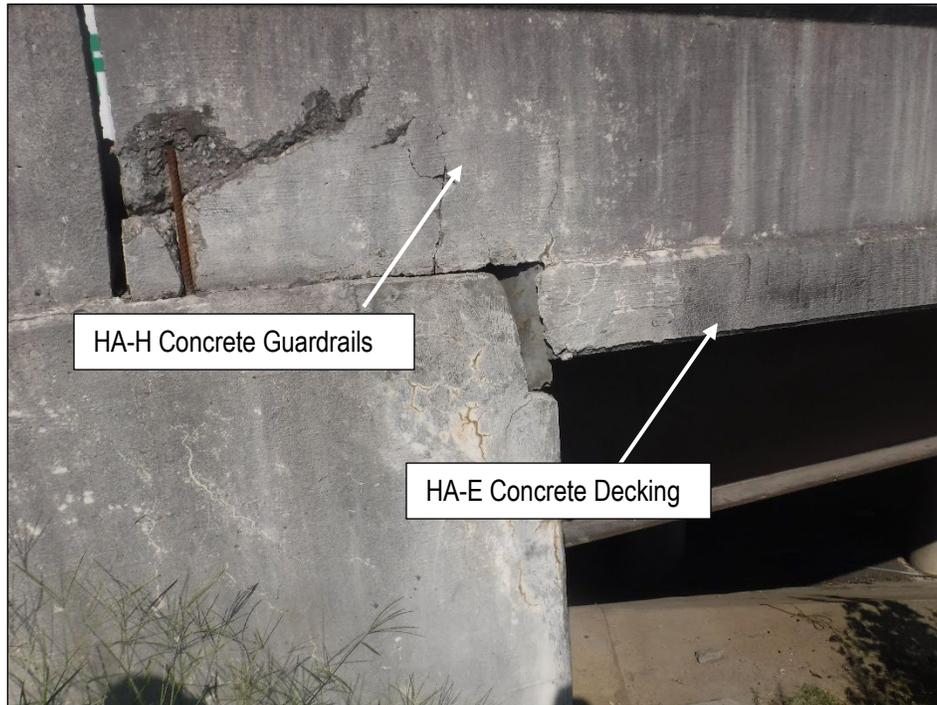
View of HA-E and HA-H on the I-24 bridge over North 1st Street.
